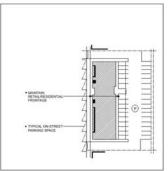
Site plan for intermediate infill site with surface parking lot partially beneath building. (See also photos, Figures 7.3 and 7.4.)
